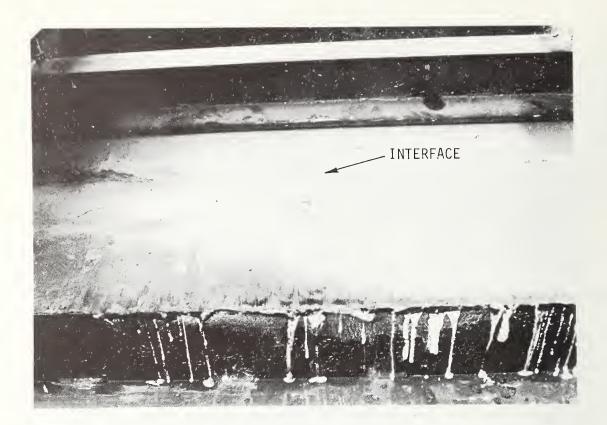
INTERFACE BETWEEN TWO CONCRETE PLACEMENTS
